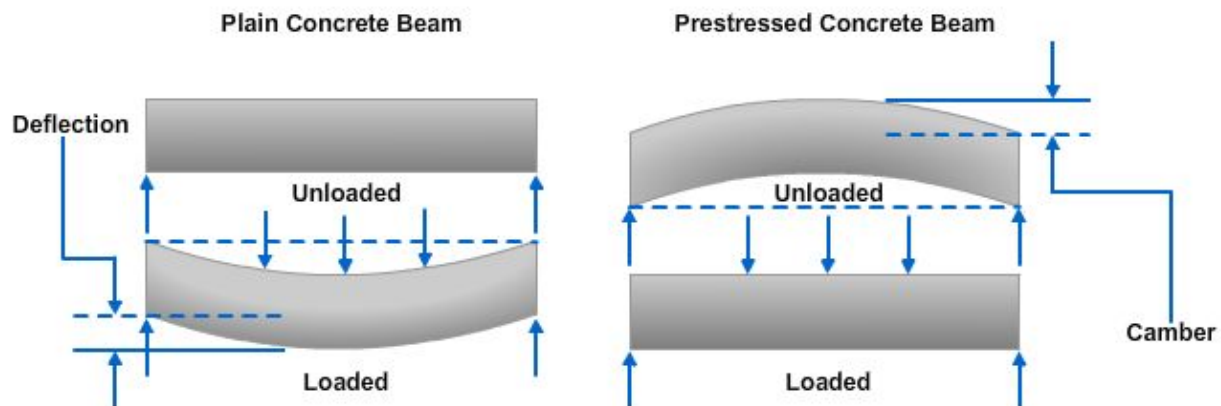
Comparison of plain and pre-stressed concrete beams.
